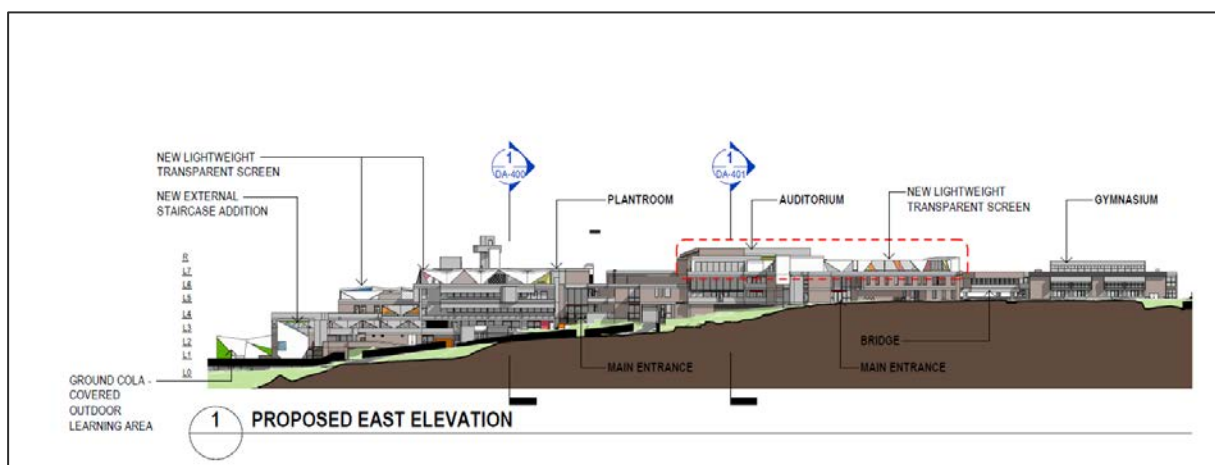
| East elevation – Phase 1 works outlined in red (Source: RtS)
